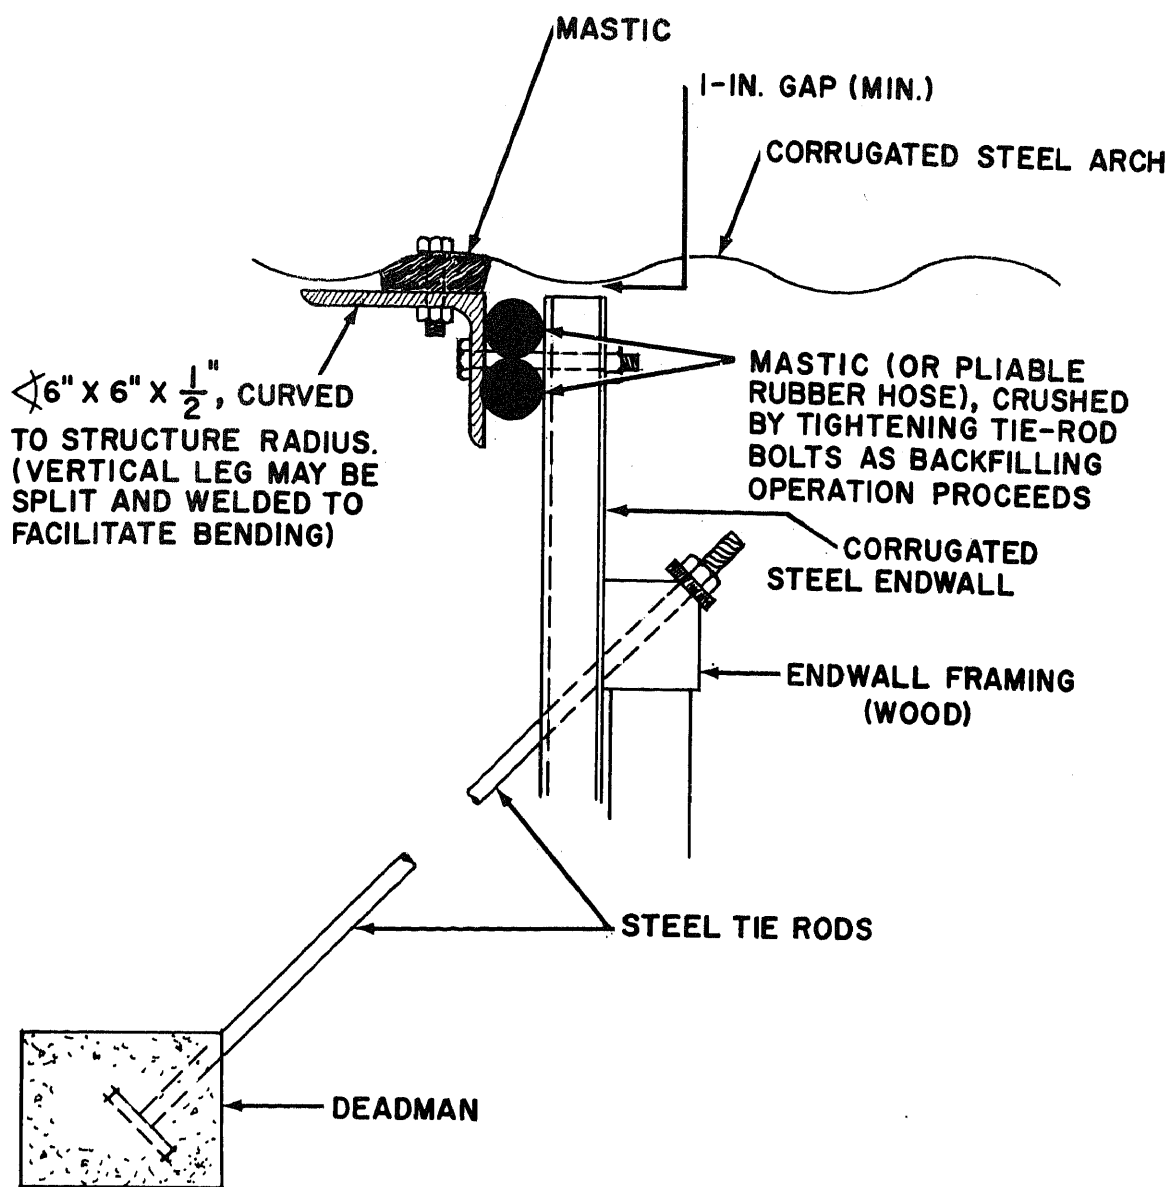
Structure- and deadman-supported endwall suitable for 50 psi. Connection details.
